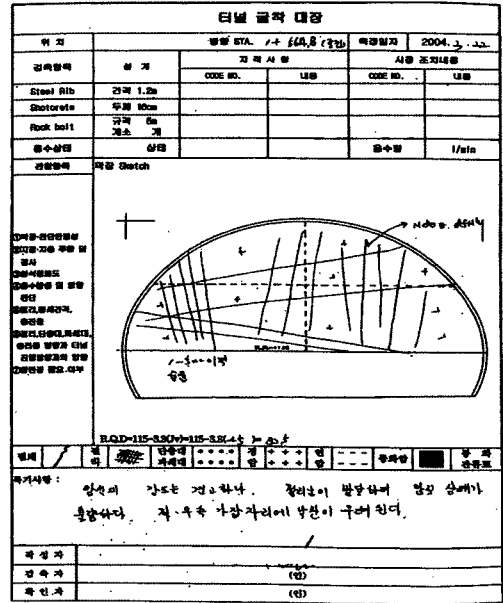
An example of a face mapping sheet used in tunnel construction site.
